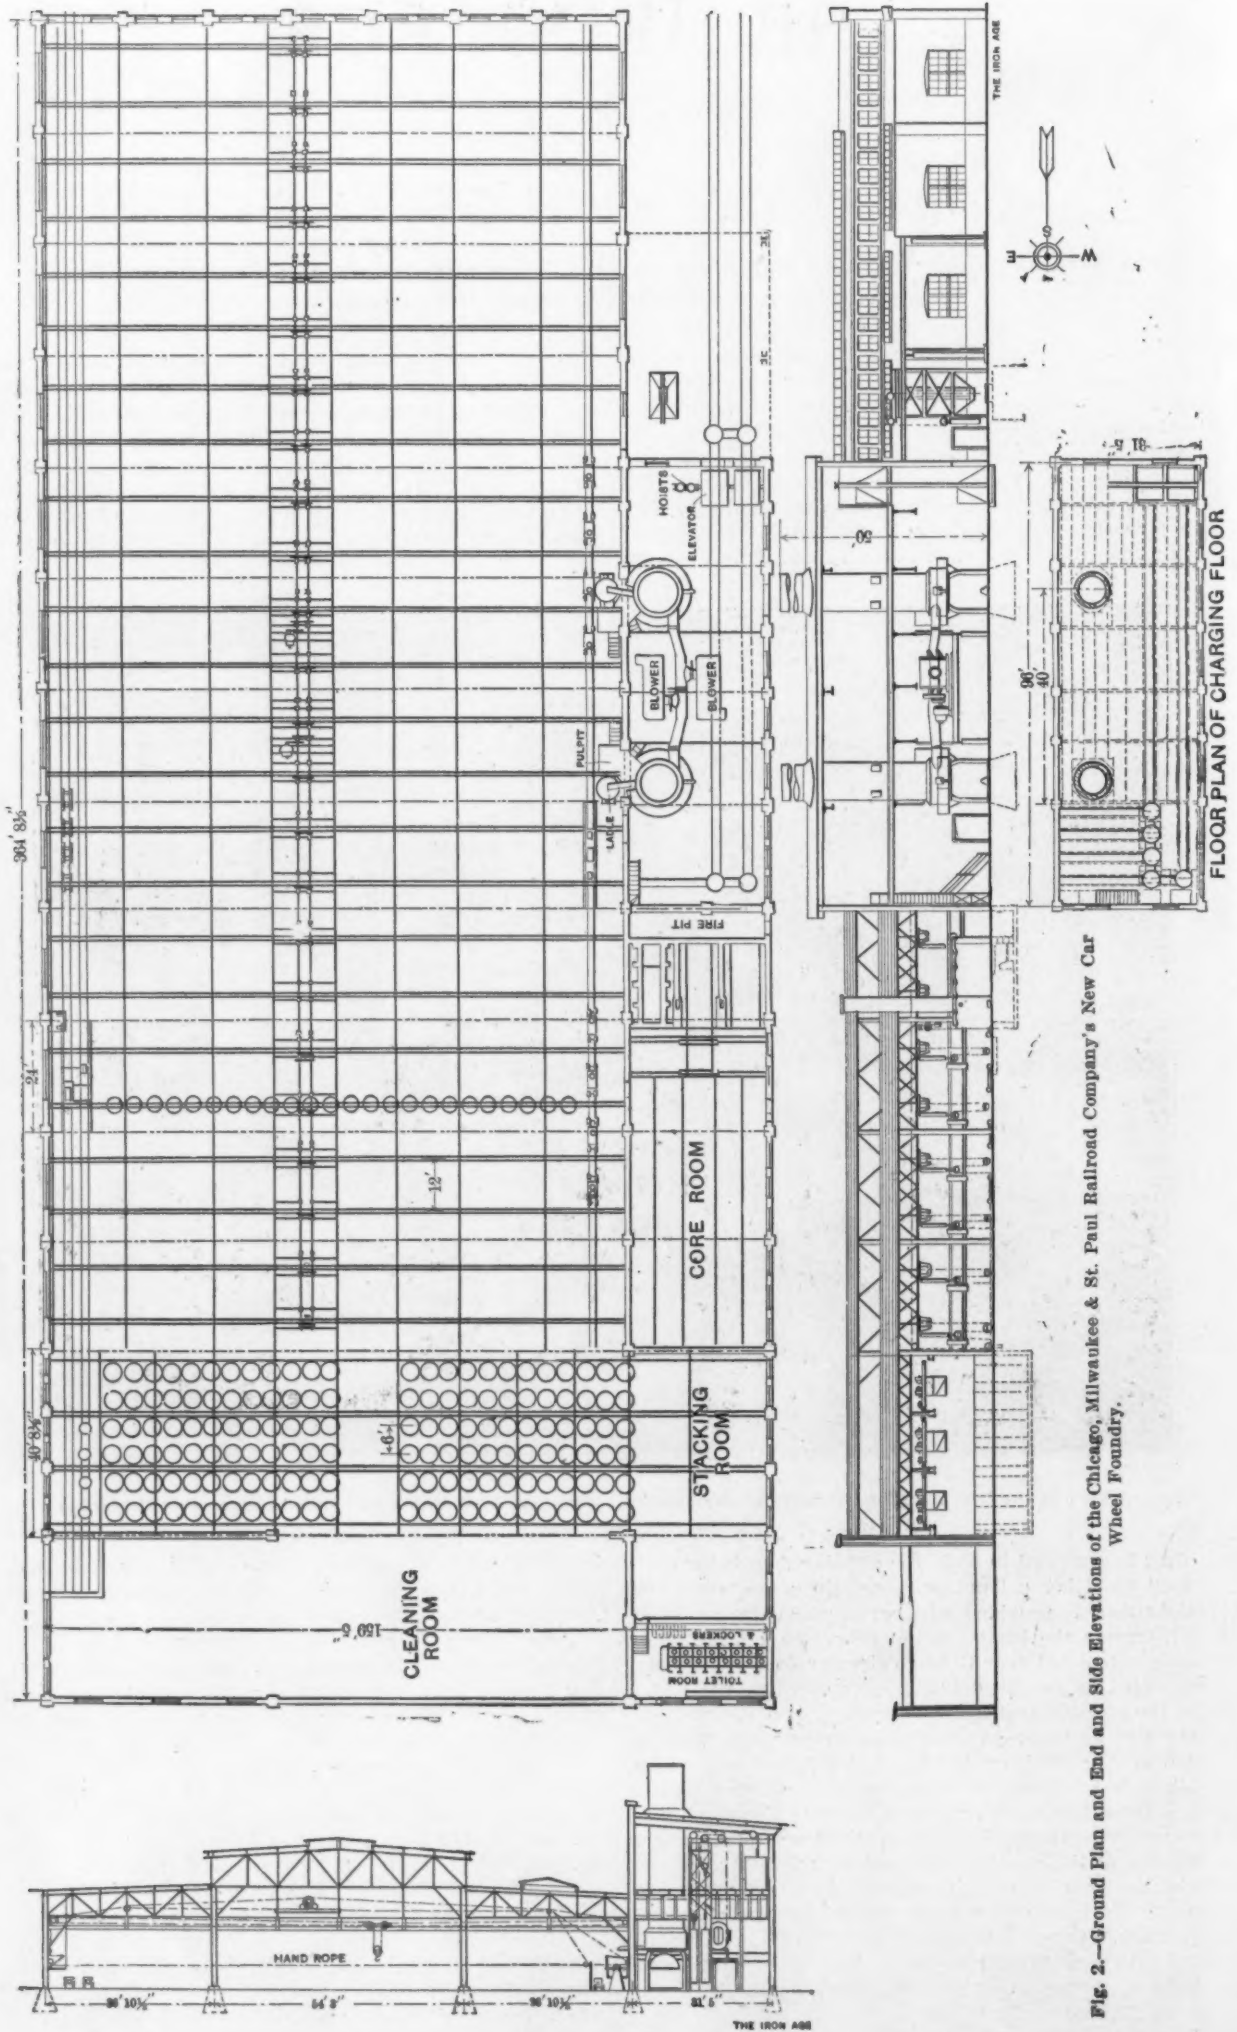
Ground Plan and End and Side Elevations of the Chicago, Milwaukee & St. Paul Railroad Company's New Car Wheel Foundry.
